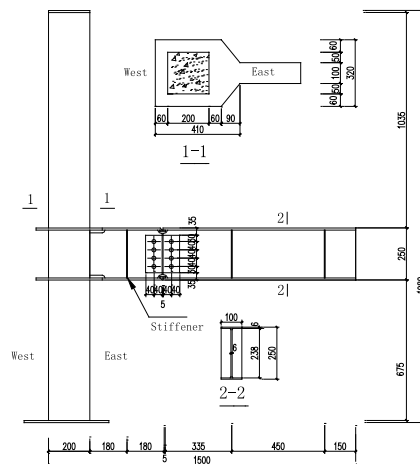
DIMENSION AND DETAILS OF SPECIMEN
